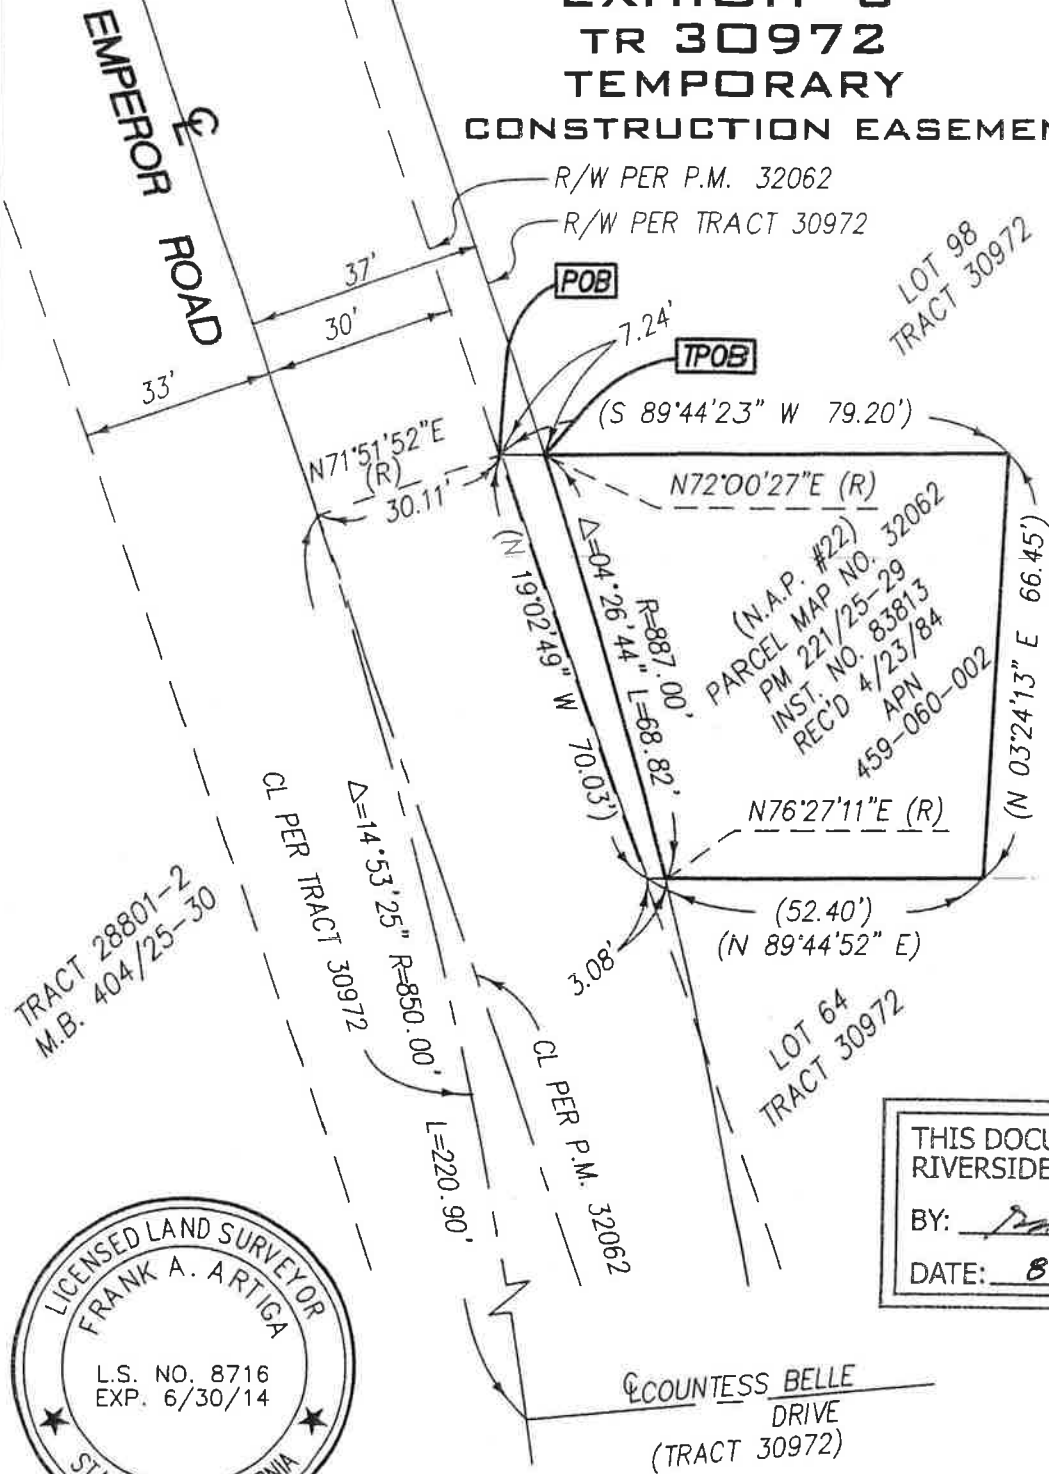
TEMPORARY CONSTRUCTION EASEMENT
